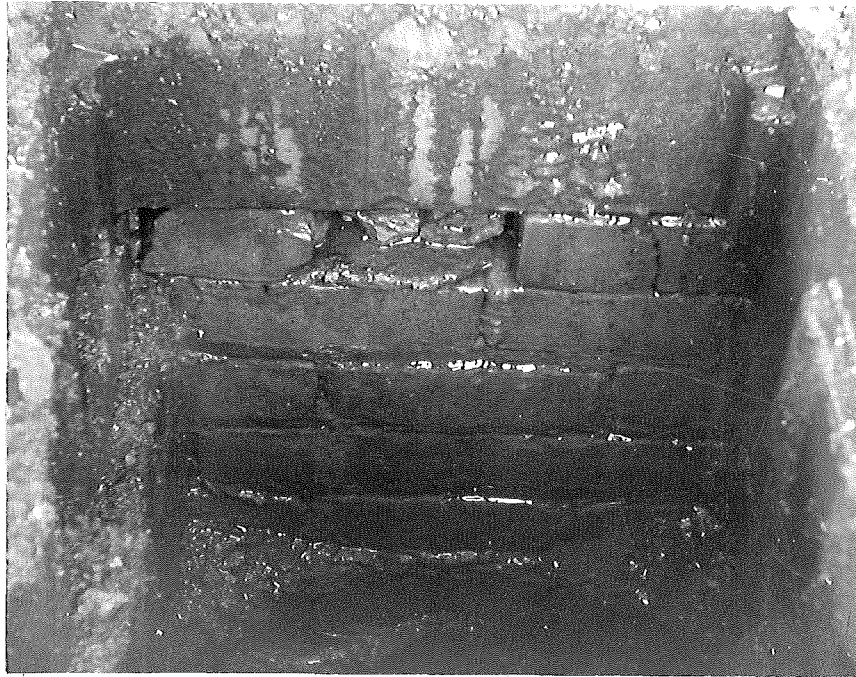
Brick failing by cracking. Catch basin at Middle Belt and N.Y.C. R.R. grade separation. Daniels Brick. Only one brick in catch basin had started to fail. Age 7 years.
